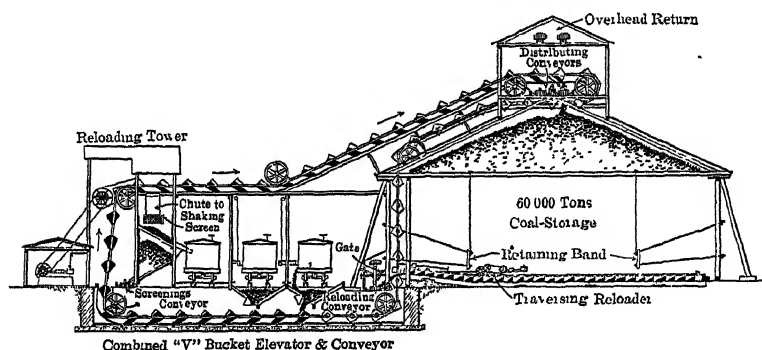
ERIE RAILROAD COVERED STORAGE- AND TRANSFER-PLANT, HAMMOND, IND. CROSS-SECTION.
